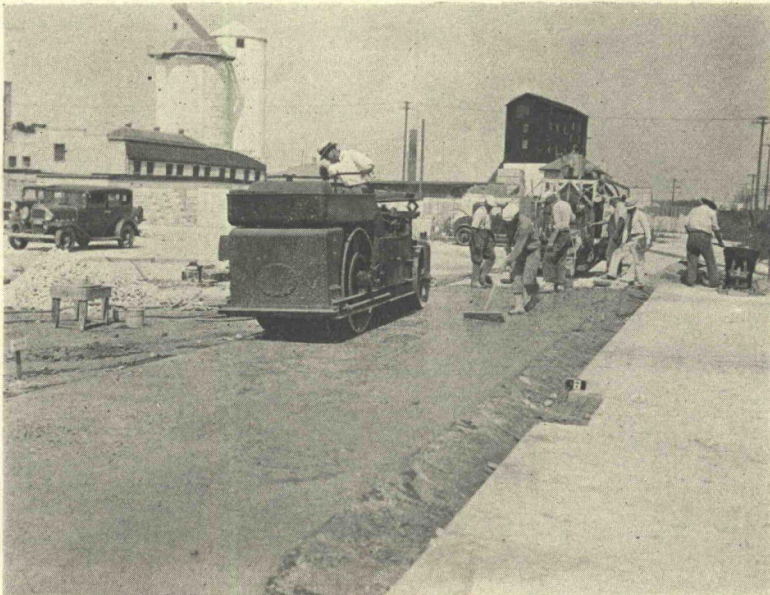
All grouted aggregates could be successfully rolled. For best results rolling should not follow too soon after grouting.
